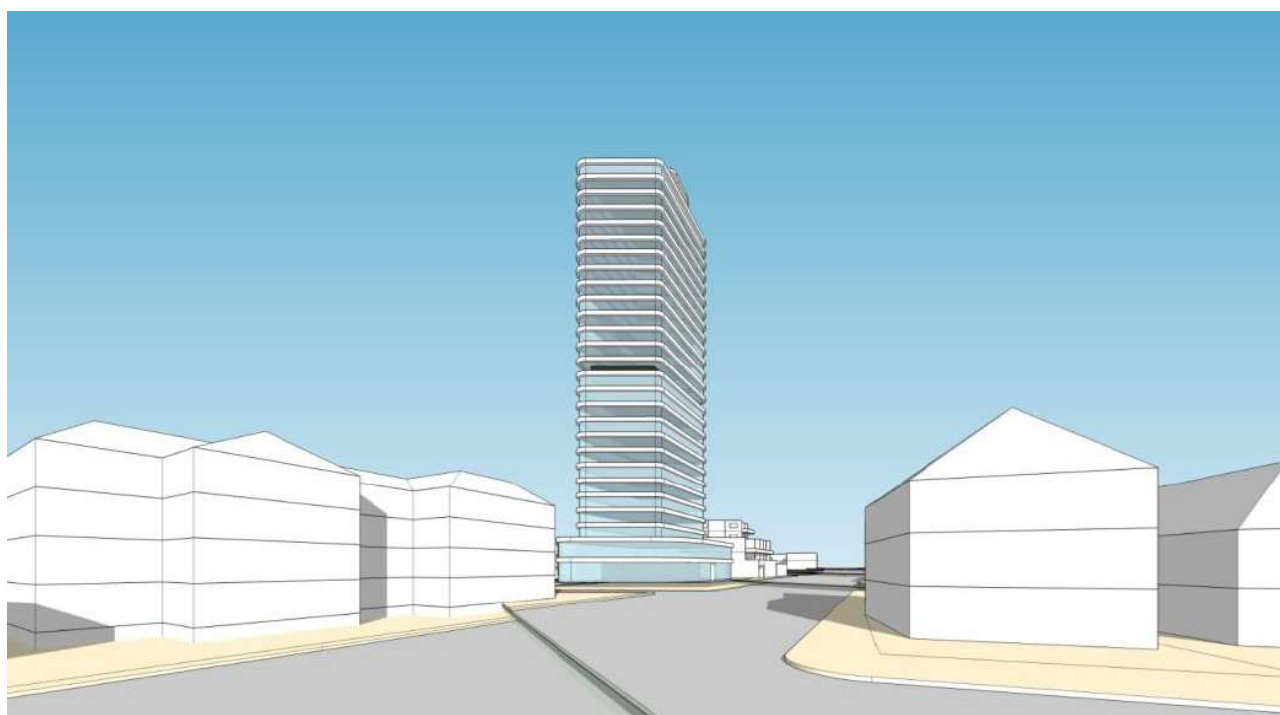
Proposed concept development plan, looking south-east (source: DEM).
